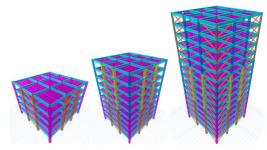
The retrofit schemes by BRB braces for the studied buildings
